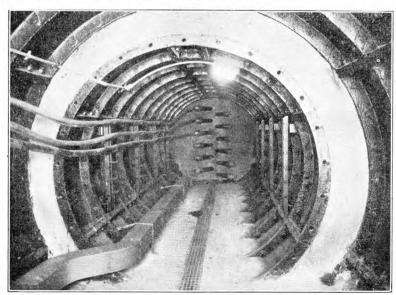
Pipe Connection from Faraday Tunnel to Waterloo and City Railway.
